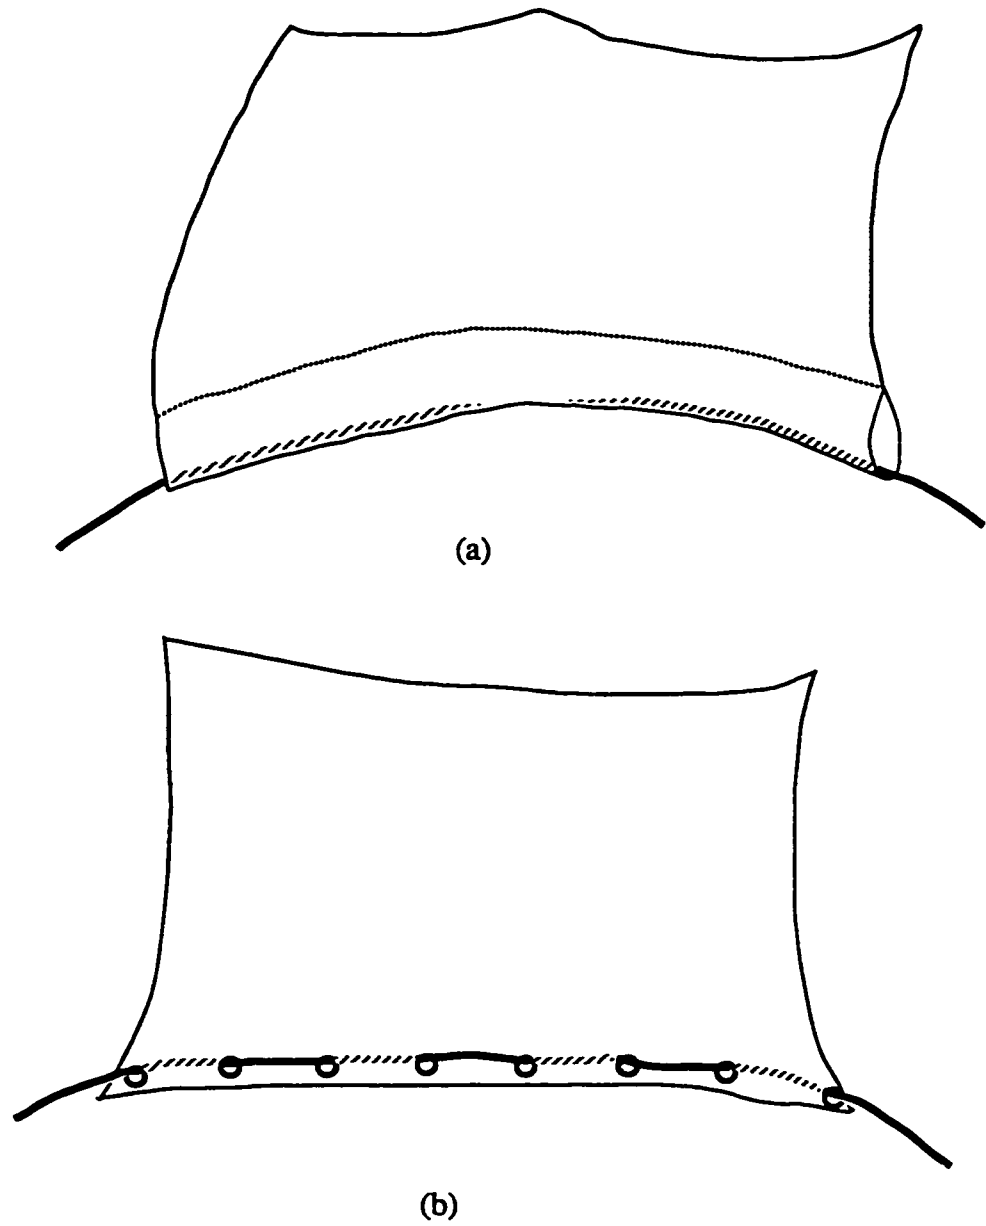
Examples of shearless cable reinforcement; (a) Cable passing through the hem, (b) cable passing through the hoops
